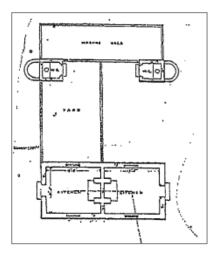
Plan of Kitchen Block and the two toilet structures. Note washing shed behind the toilets and a yard linking the Kitchen with the shed.
